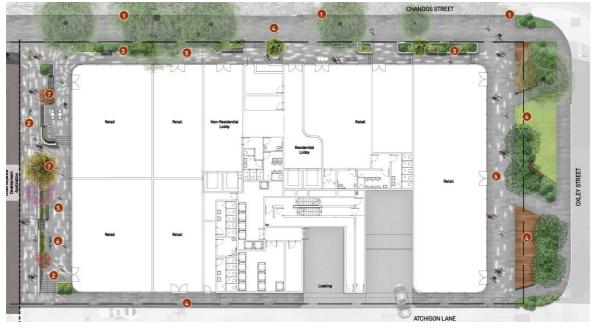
Overall Landscape PlanSource: Ground Ink Landscape Architects
